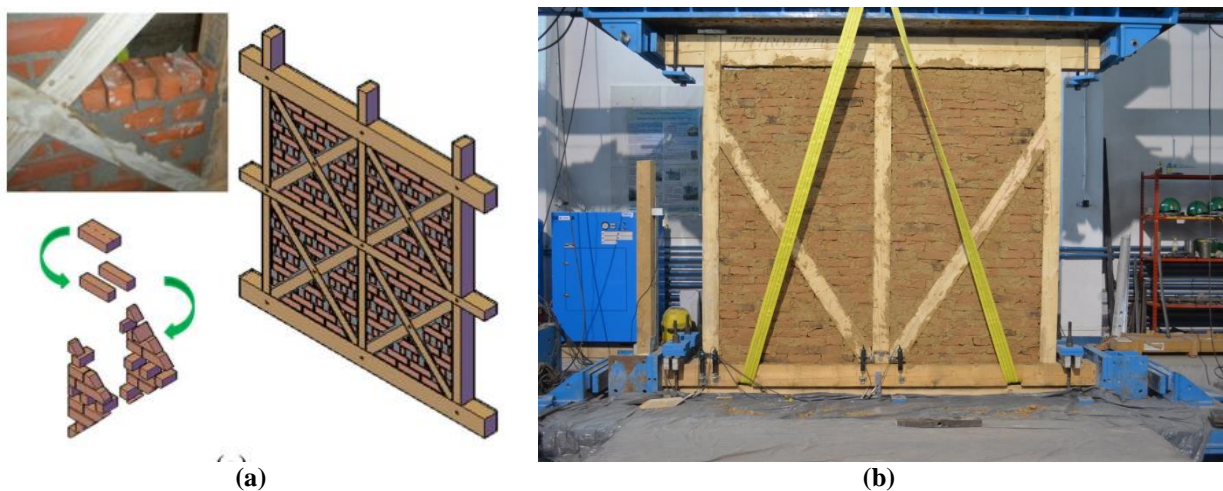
Pombalino timber-framed wall (a) and Romanian one (b) with masonry infill [11].
